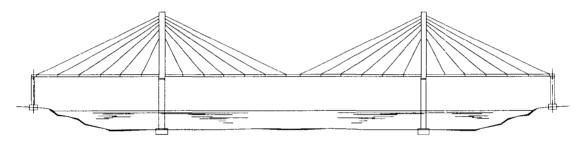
Conceptual Composite Cable-Stayed Bridge
